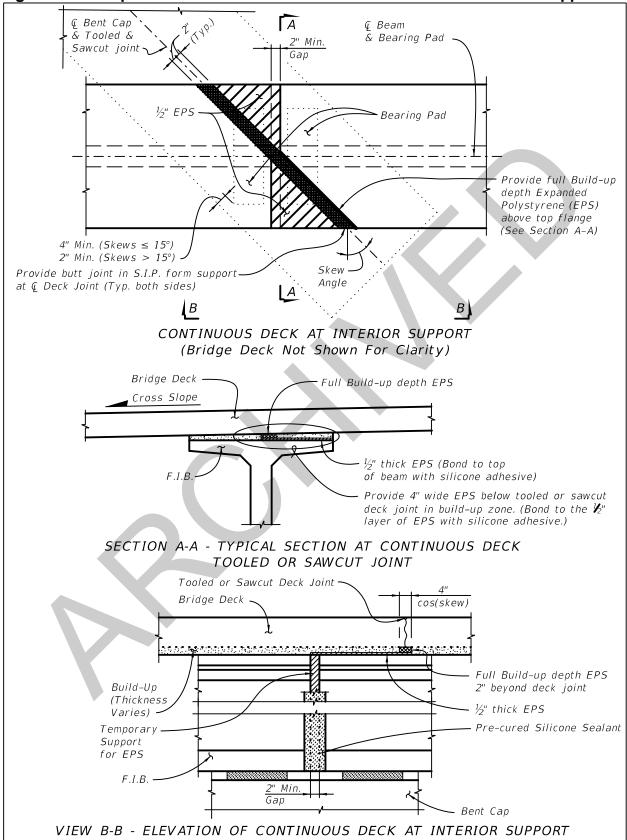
Squared Beam End Details – Continuous Deck at Interior Support
